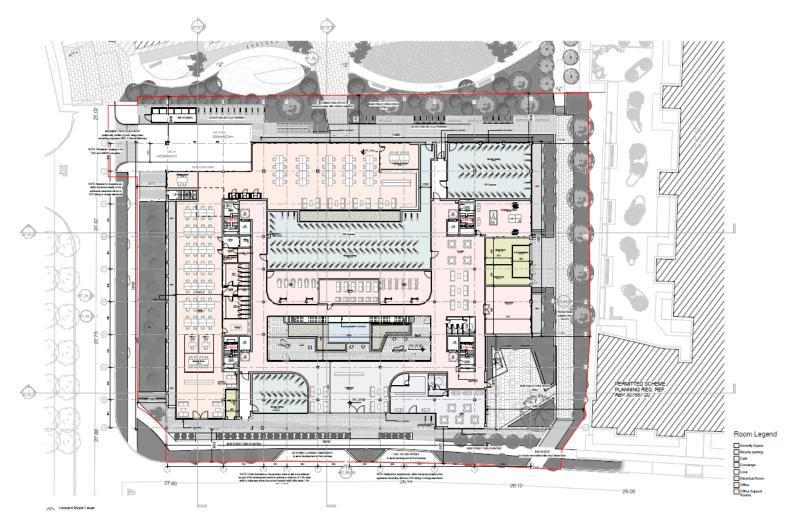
Site layout (Ground Floor) (Drawing no. 487\_02\_00 Plus Architecture, July 2022)
